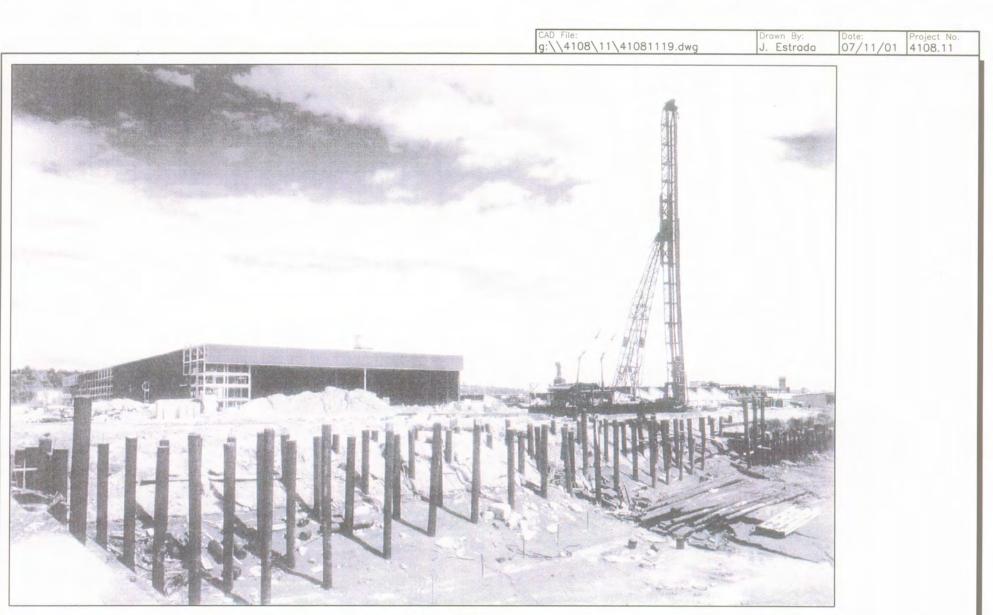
Site Photograph 2 - June 2001 Former Isaacson Steel Site Seattle, Washington ERM 07/01
